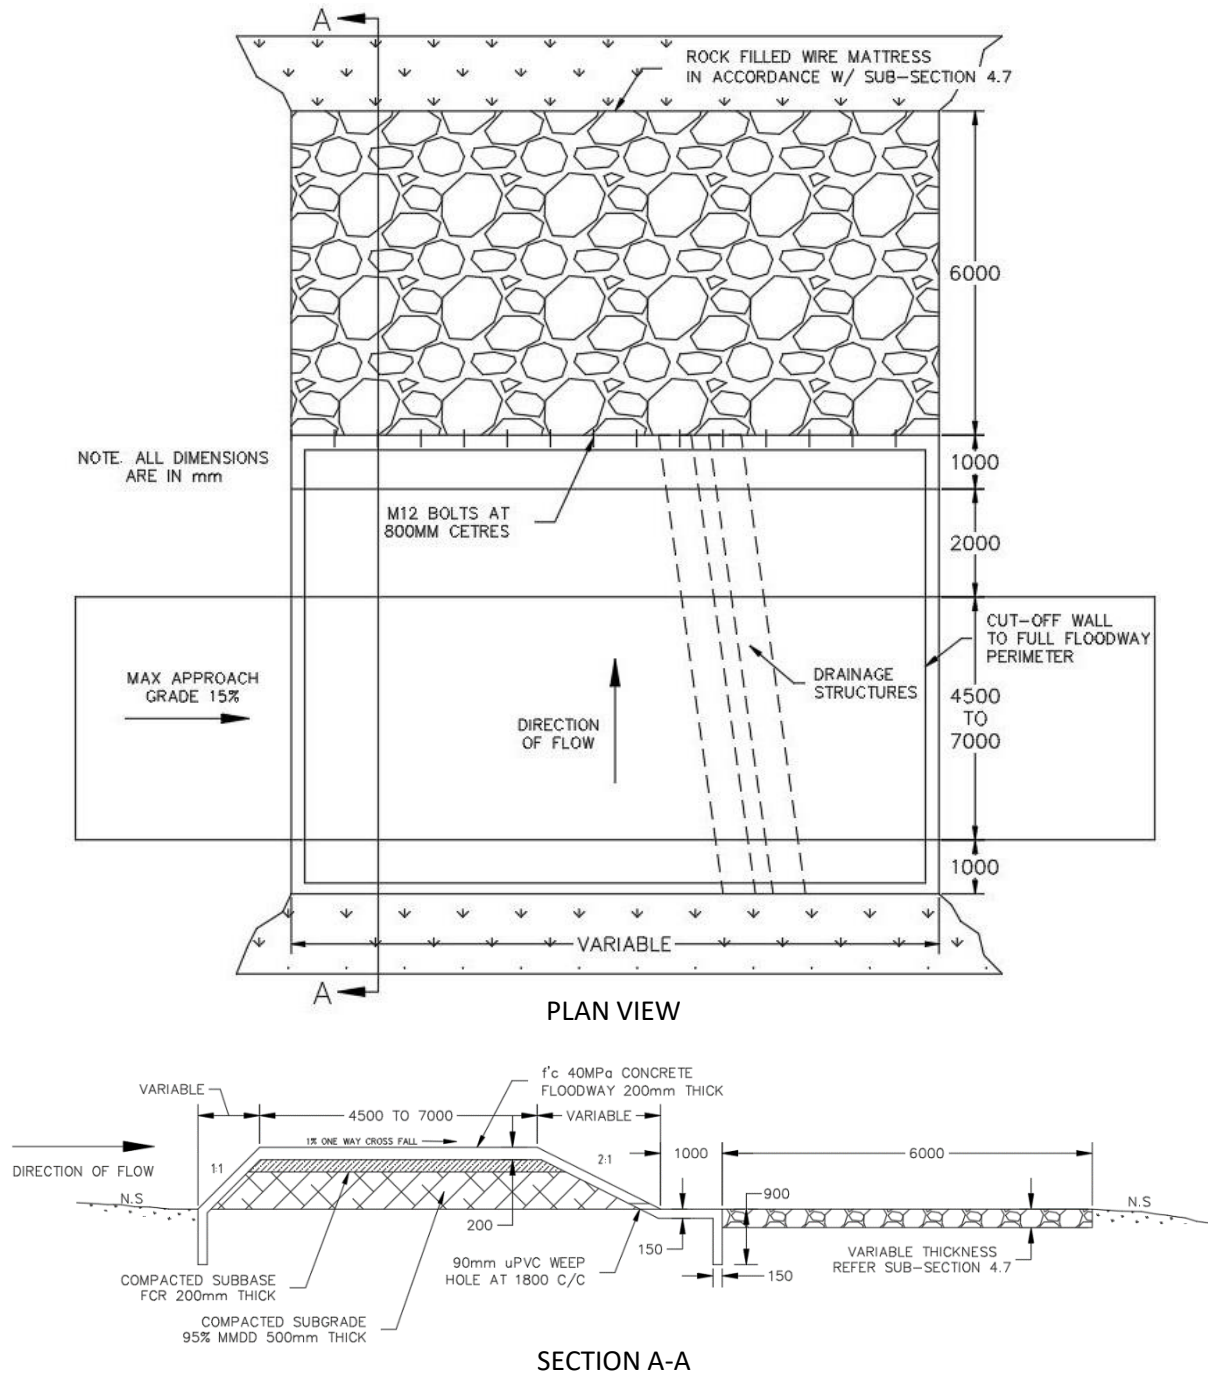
Floodway Type 4 details (LVRC 2008d).
